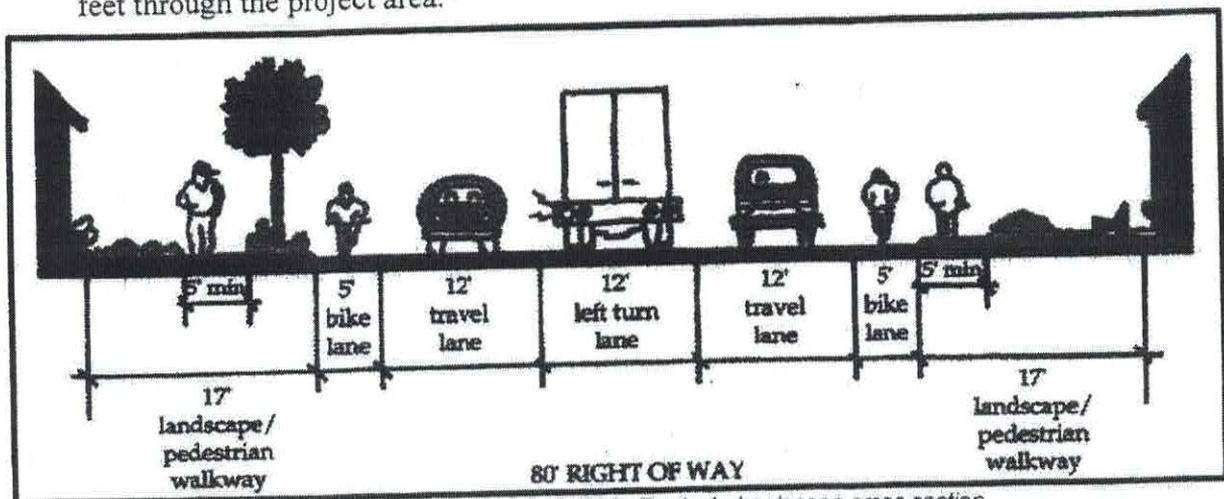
2002 Gualala Town Plan State Route 1 streetscape cross section.
